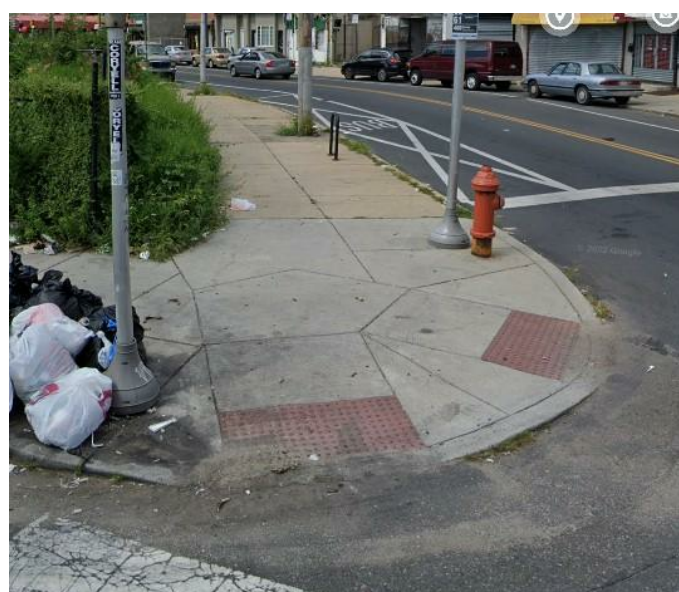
CORNER CURB RAMP AT THE INTERSECTION OF RIDGE AVE AND OXFORD ST
